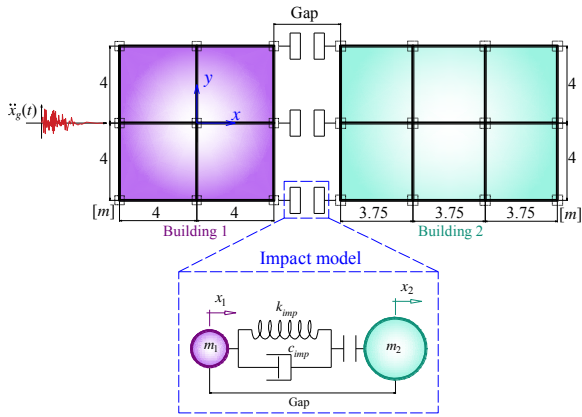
Plan view of the adjacent RC building structures and the impact model
